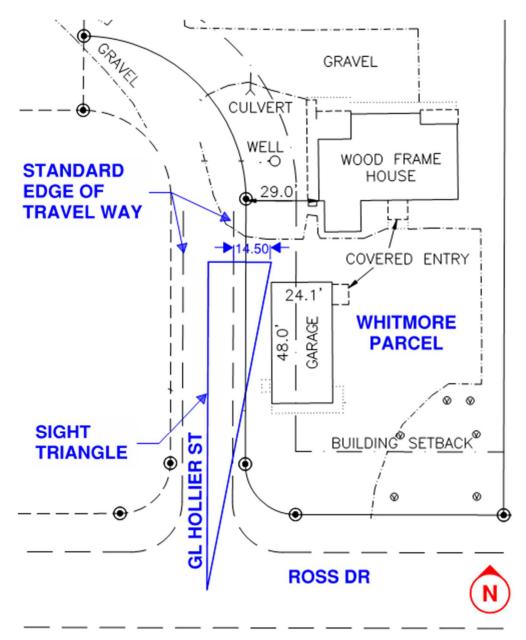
Sight triangle shown on site as-built from Peninsula Surveying, LLC
